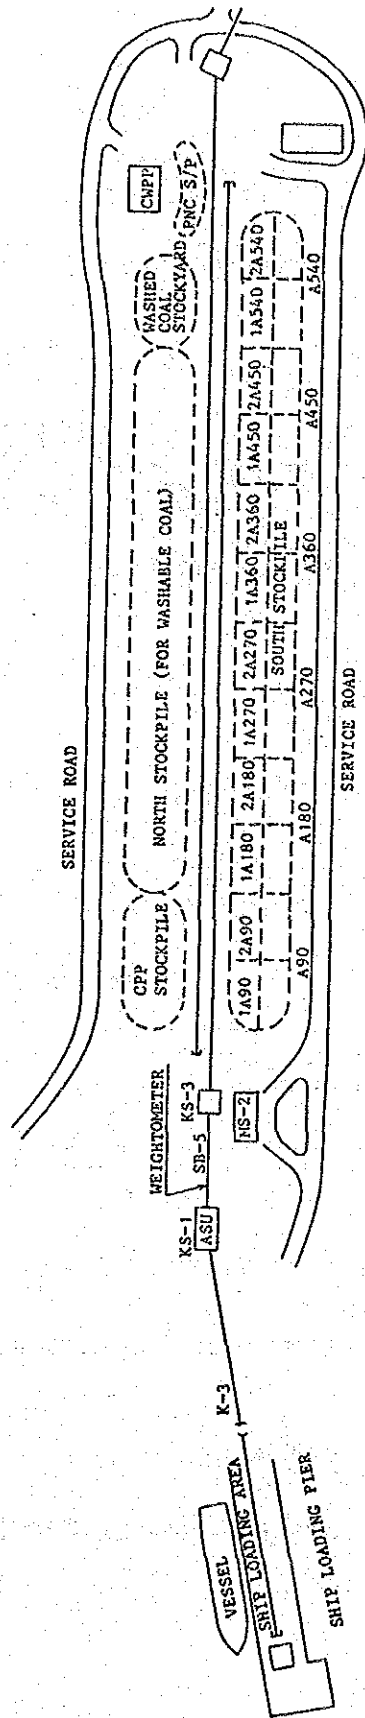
shows the layout of coal stockpile area and coal handling facilities.
